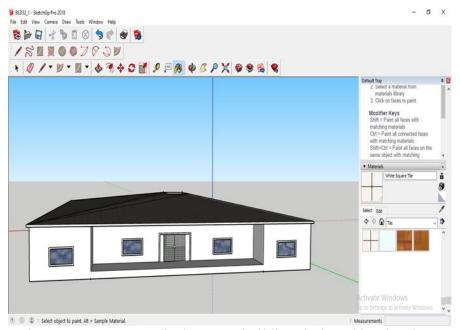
'New Day Medical Centre' building designed in Sketch up pro.
